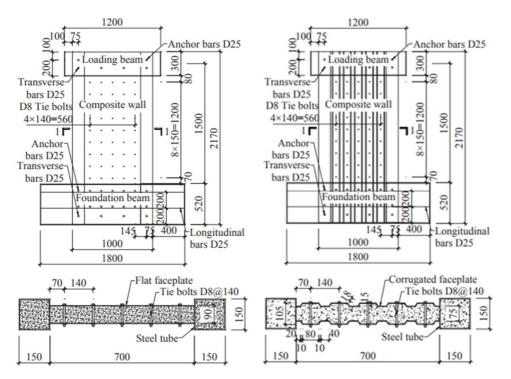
CFSP wall specimens with flat faceplates and corrugated faceplates
